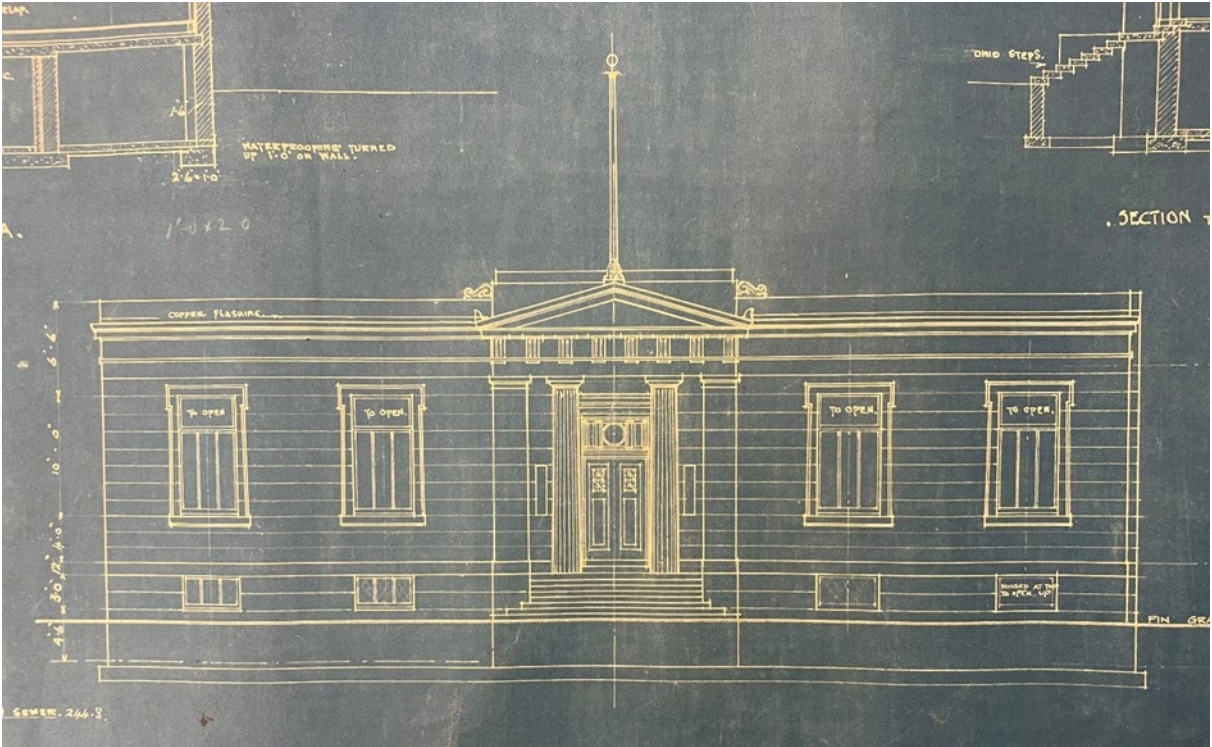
Building Records, Toronto Department of Buildings, Permit No.30992 (1919), showing the extended northwest elevation on Cherry and Villiers streets (City of Toronto Archives).
